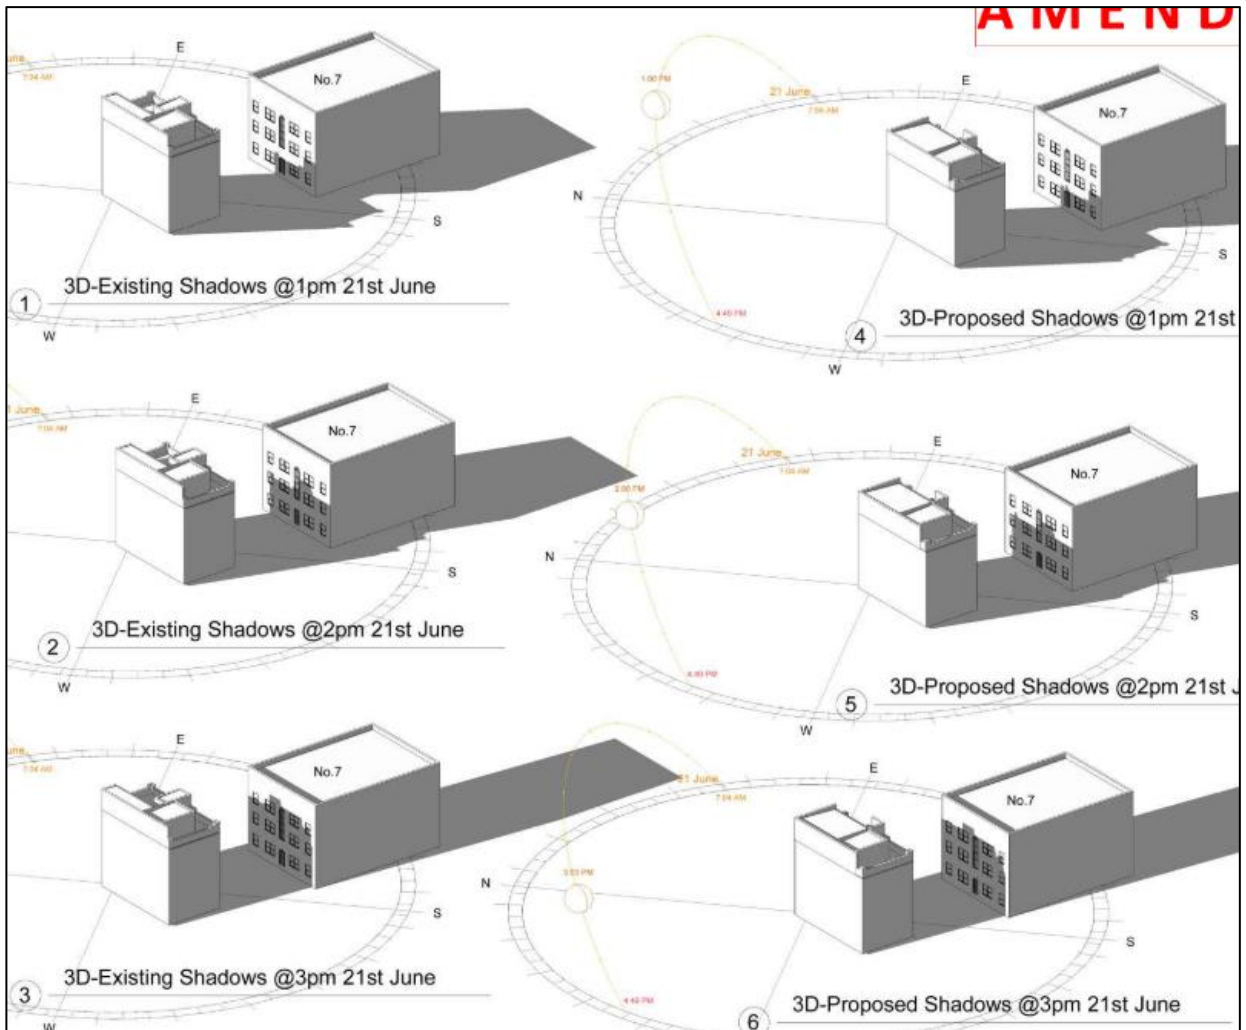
3D shadow diagrams demonstrate no additional shadowing to northwestern facing windows to 7 Beach Road. (Source: DBCF Pty Ltd, 2024)
